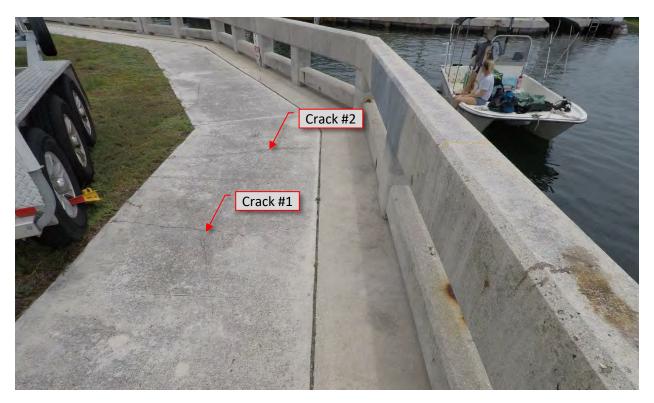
STA 6+00 - 6+10. Cracks in concrete slab to sidewalk.
